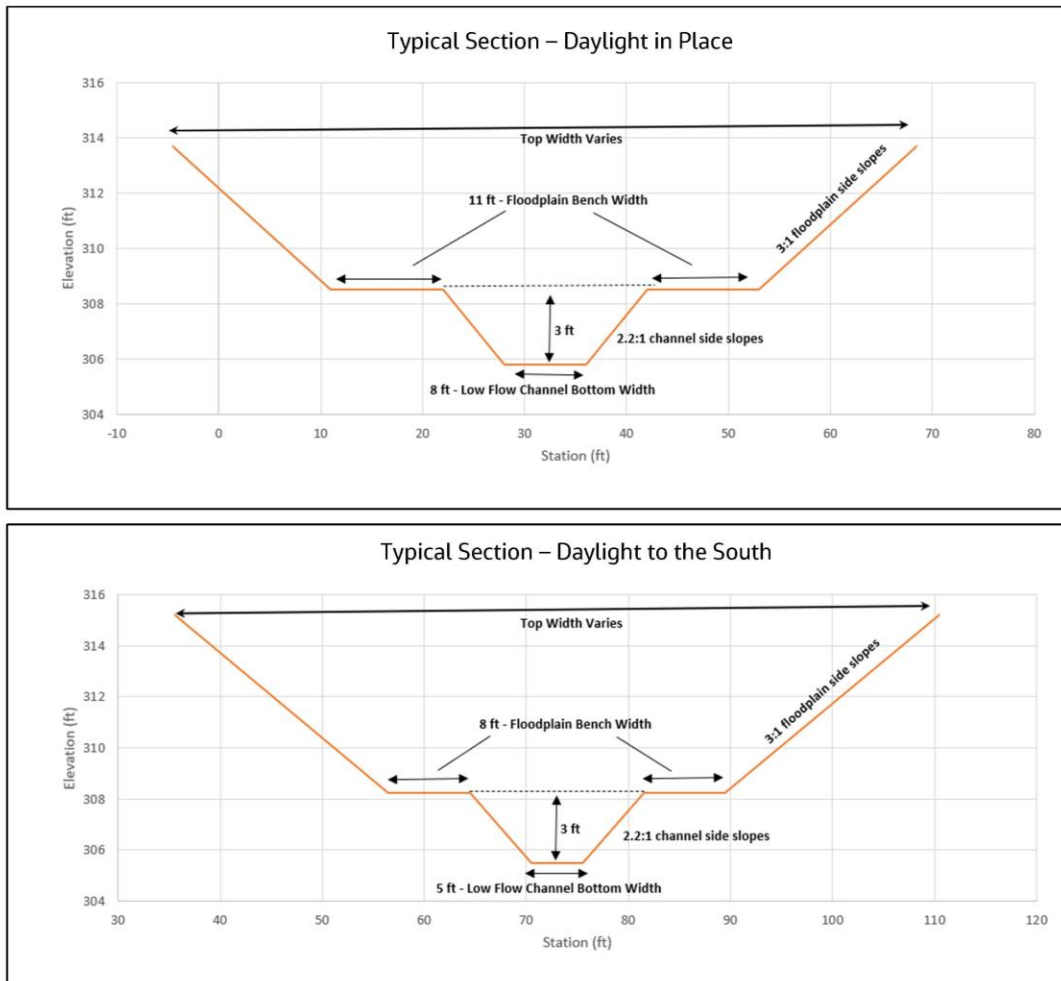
Typical Cross Sections for Creek Daylighting Alternatives
